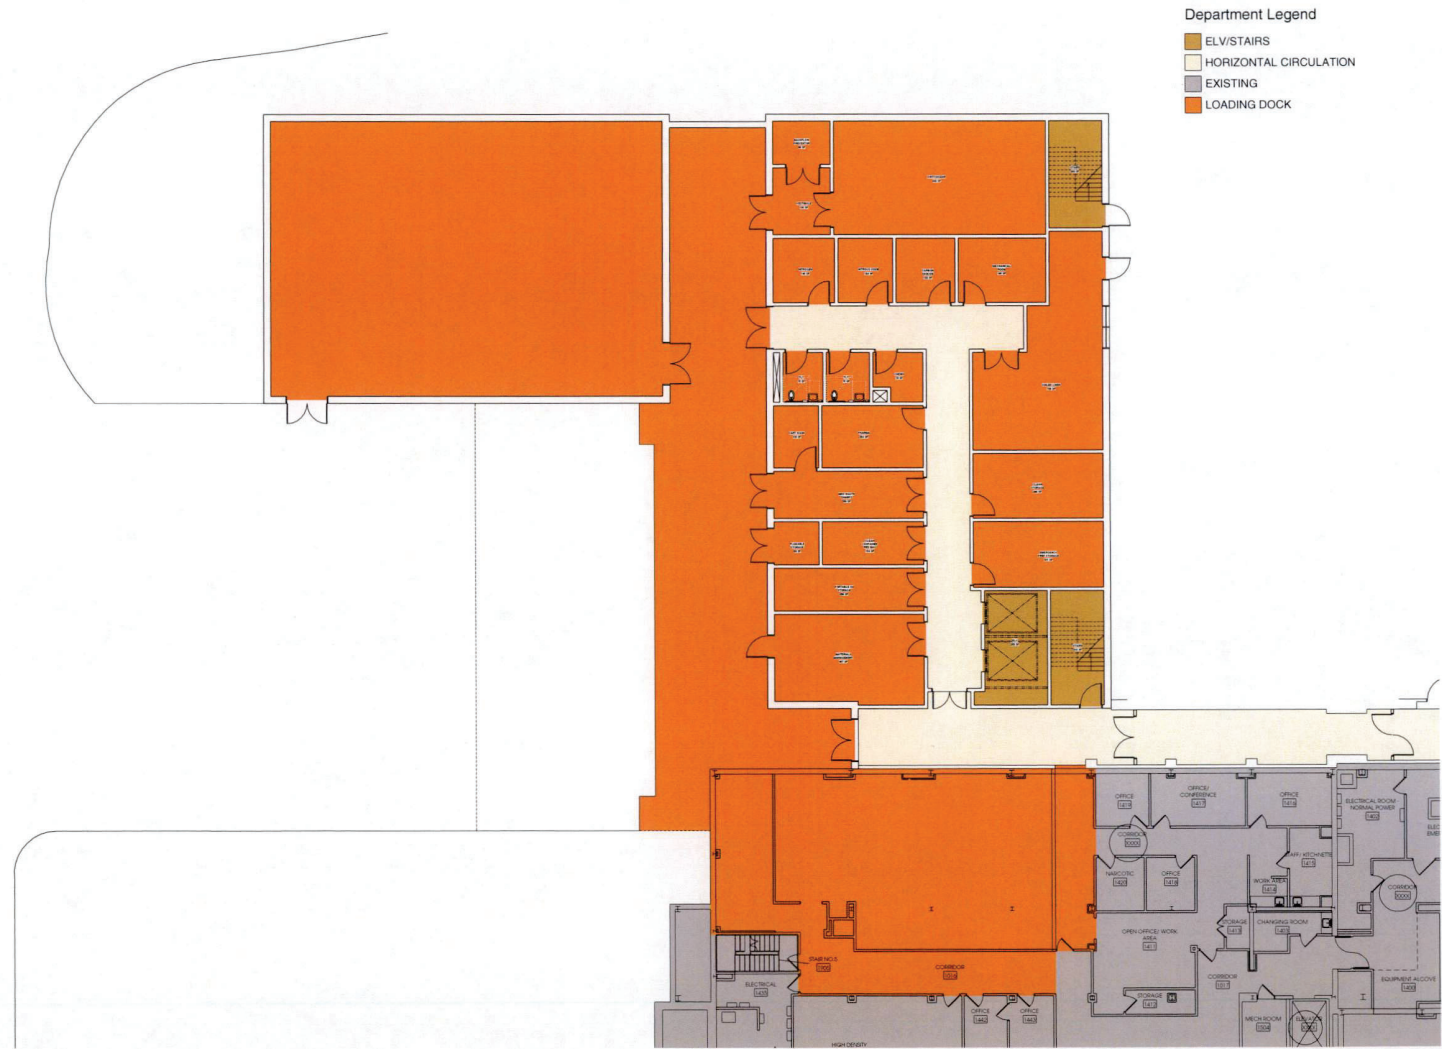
SECOND FLOOR LOADING DOCK EXPANSION
